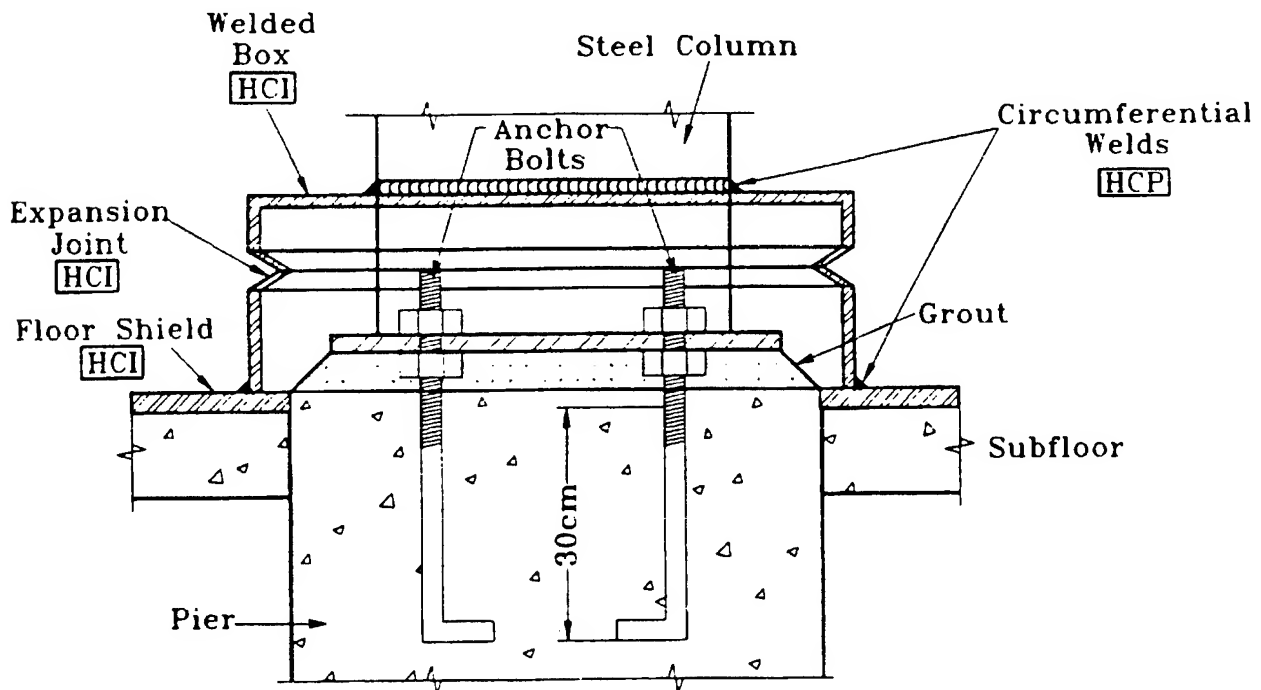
Alternate treatment of a steel column at the floor shield.
